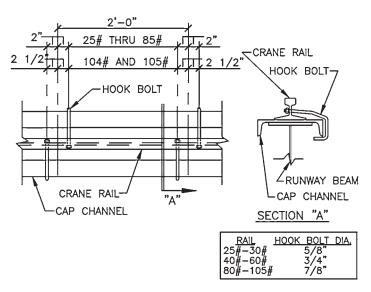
Attachment of crane rail to runway beam by hook bolts. (*Nucor Building Systems.*)
